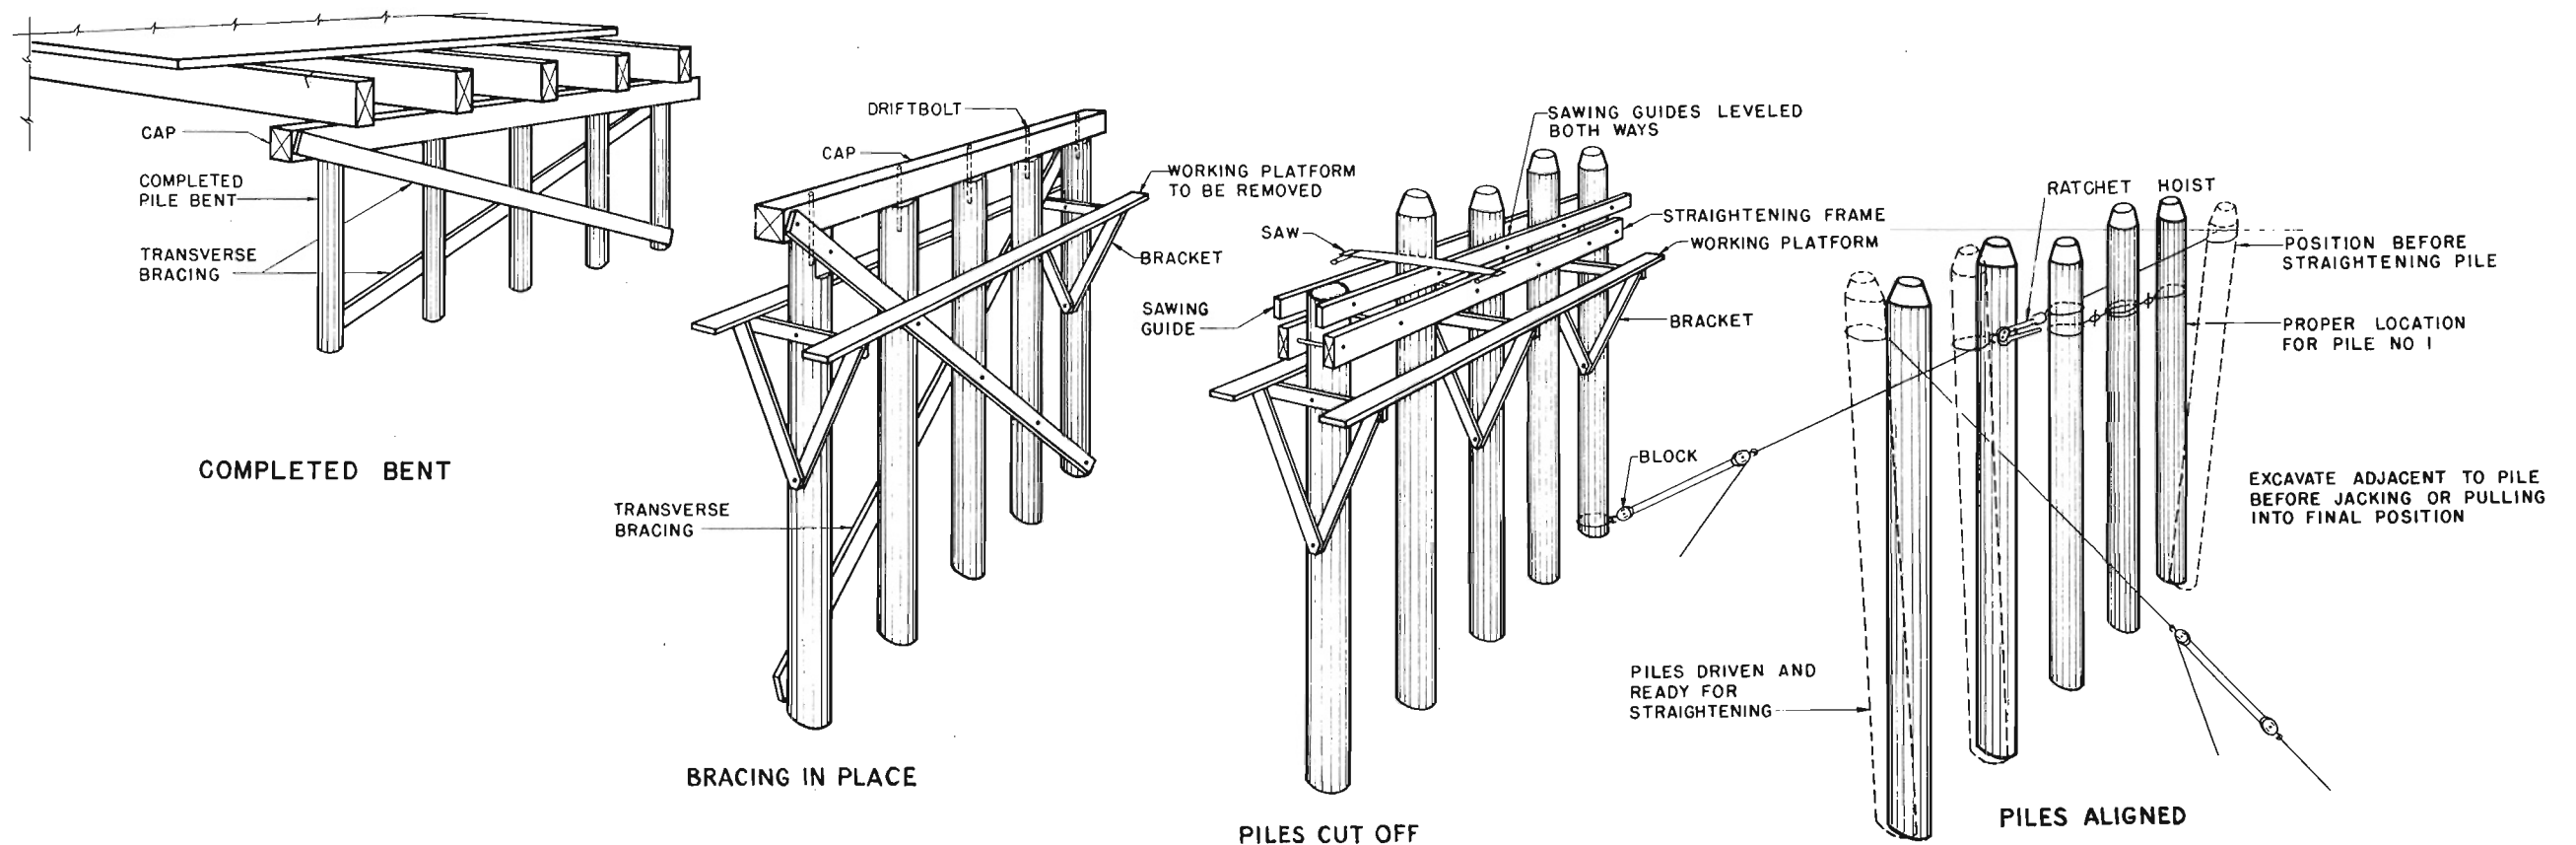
Aligning timber piles and successive steps in completing pile bents.
